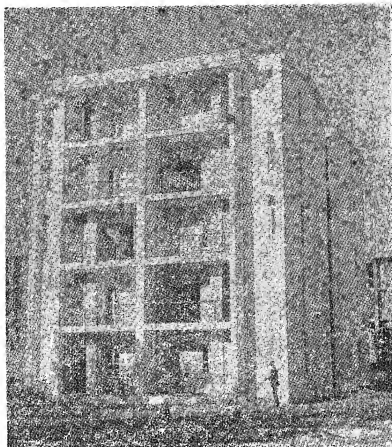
PHOTO No. III SINGLE BRICK THIC LOW COST PROJECT
